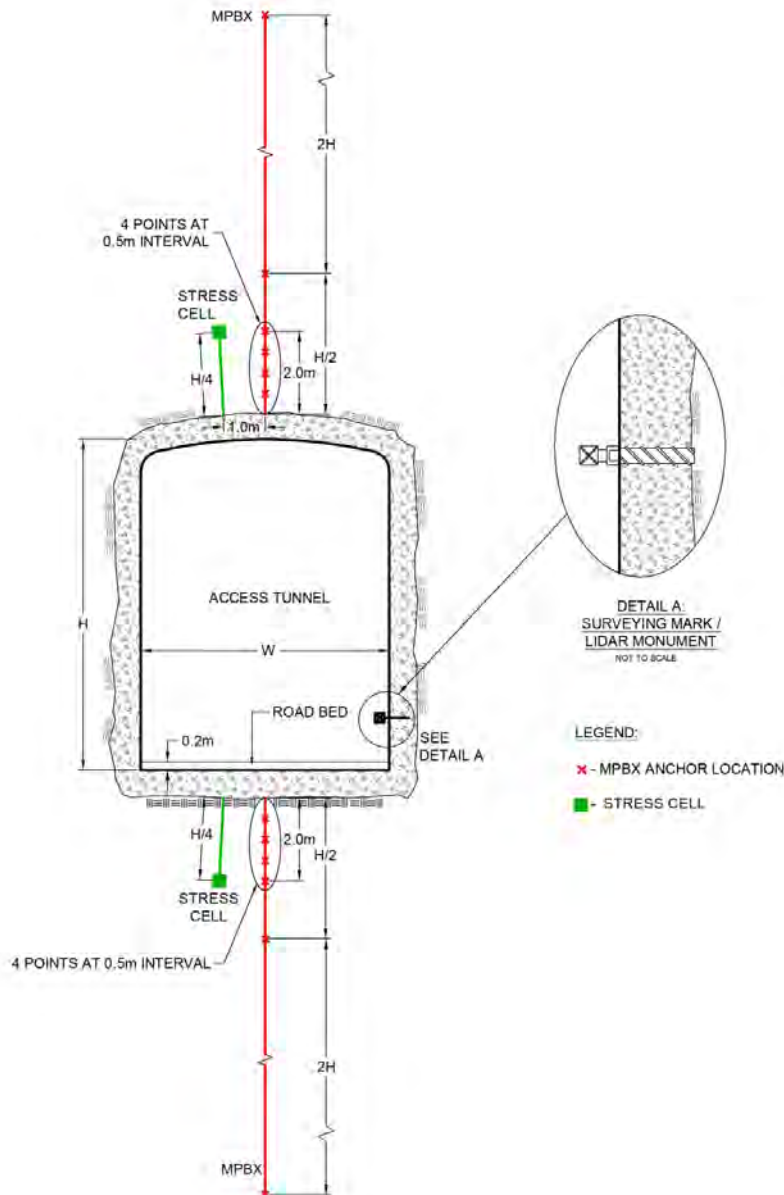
Typical Instrumentation Array in Access Tunnels
